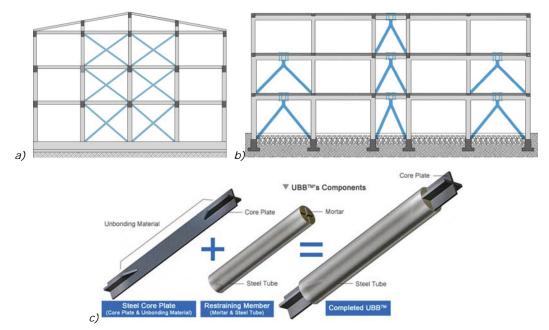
Example of bracing systems to increase the capacity of existing buildings: a) CBF, b) EBF, c) BRB.
